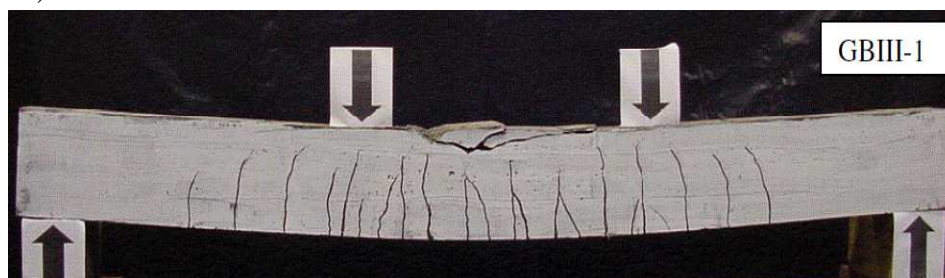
Example of reinforced concrete beams from geopolymeric concrete damage [28]
